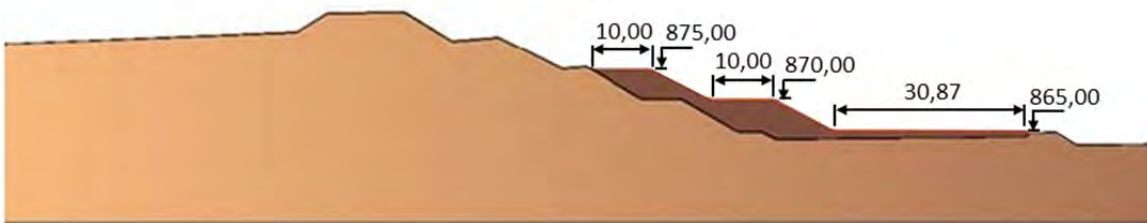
Reinforcement berm for left abutment setback, August, 2014
